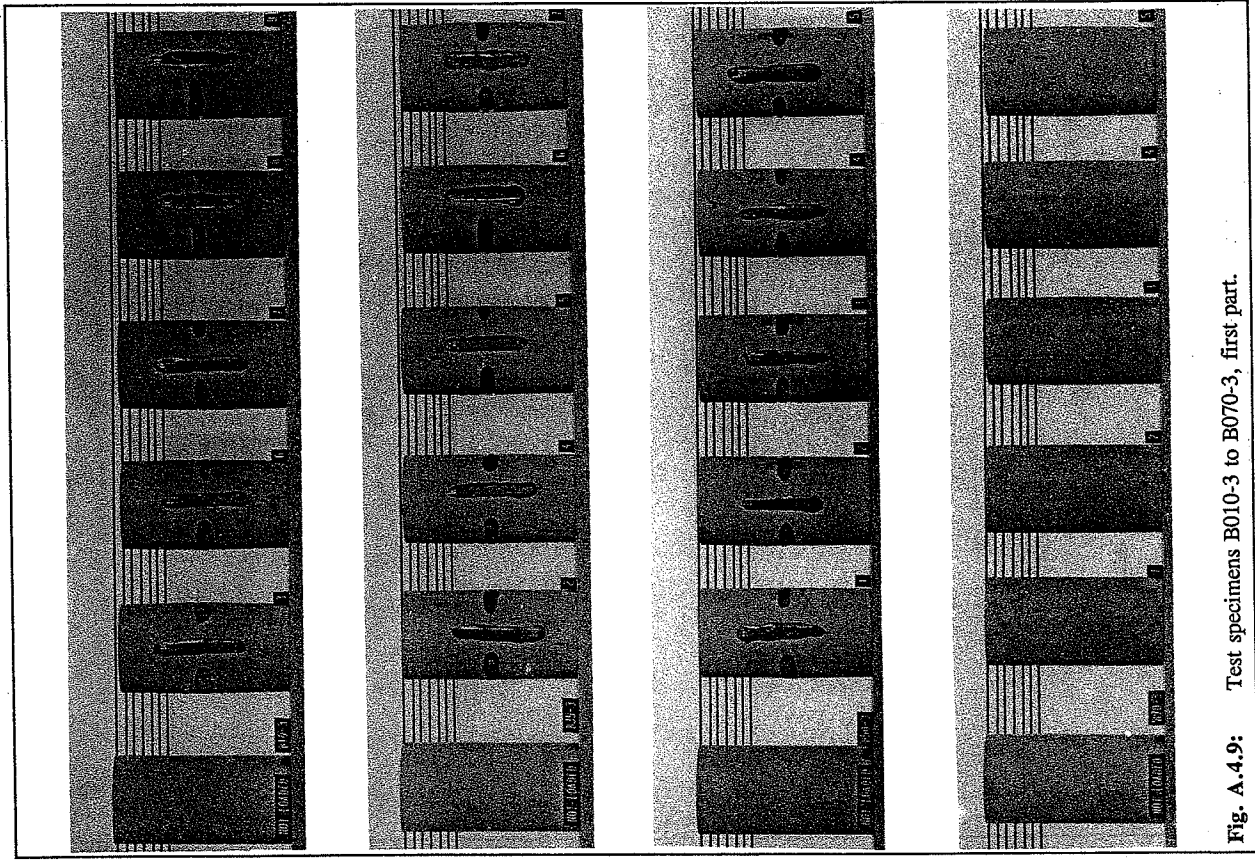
Test specimens B010-3 to B070-3, first part.
